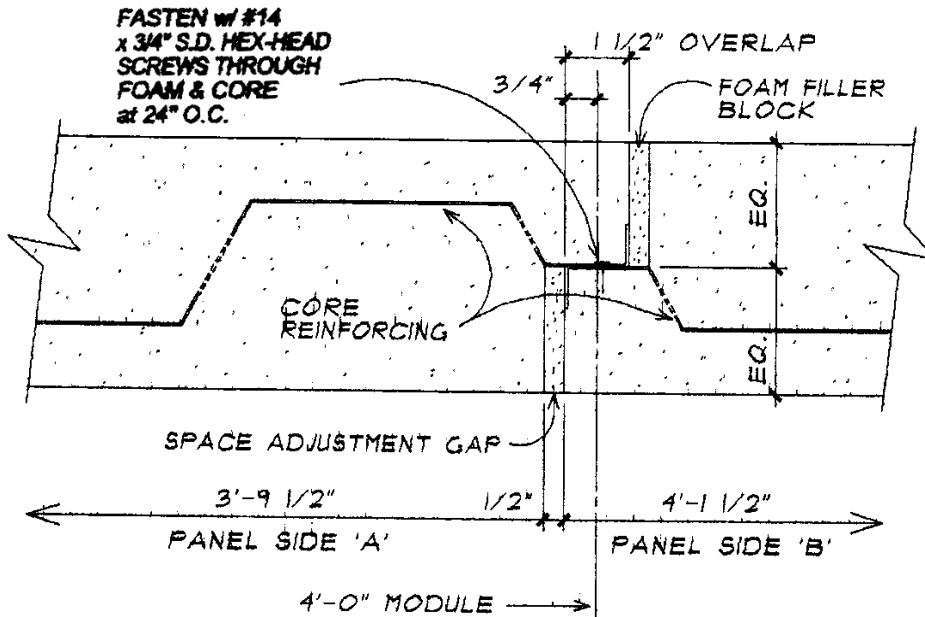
TYPICAL PANEL JOINT CONNECTION DETAIL
